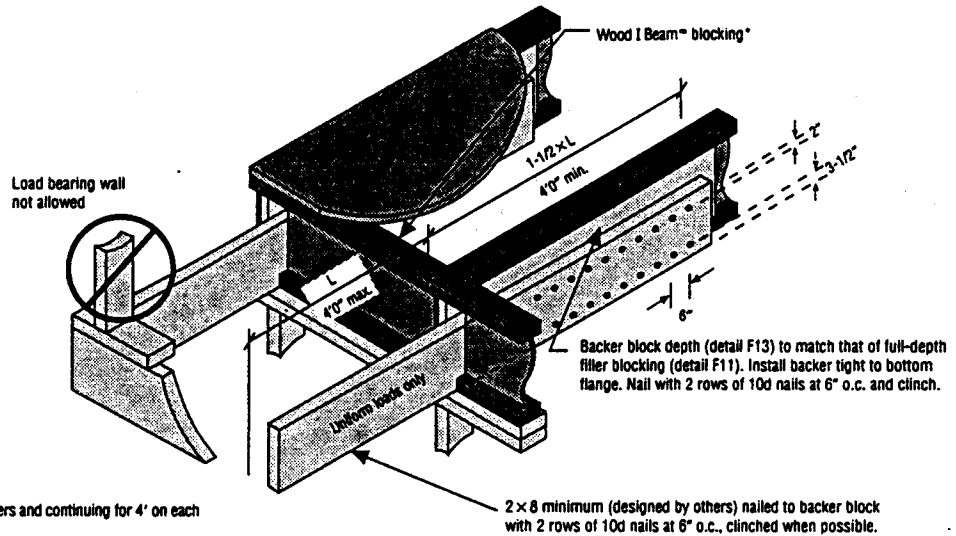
CONTINUED – NON-LOAD BEARING CANTILEVER DETAILS
